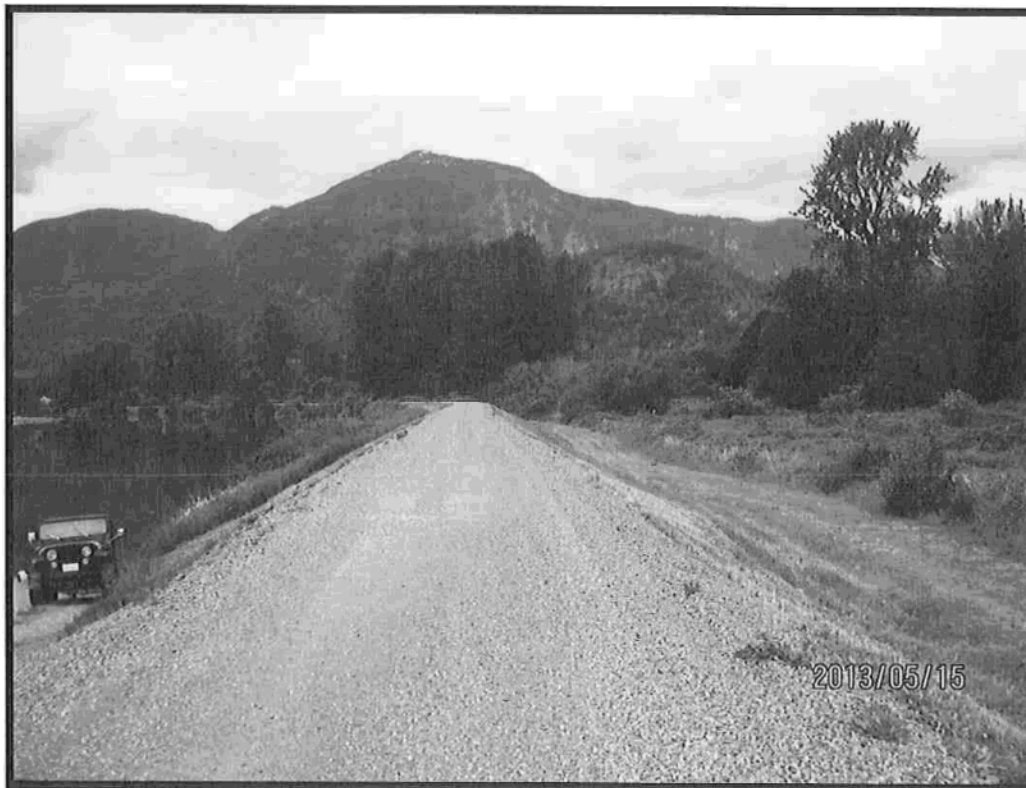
Looking west at Dike C from the Hamilton Road crossing (May 15, 2013)
